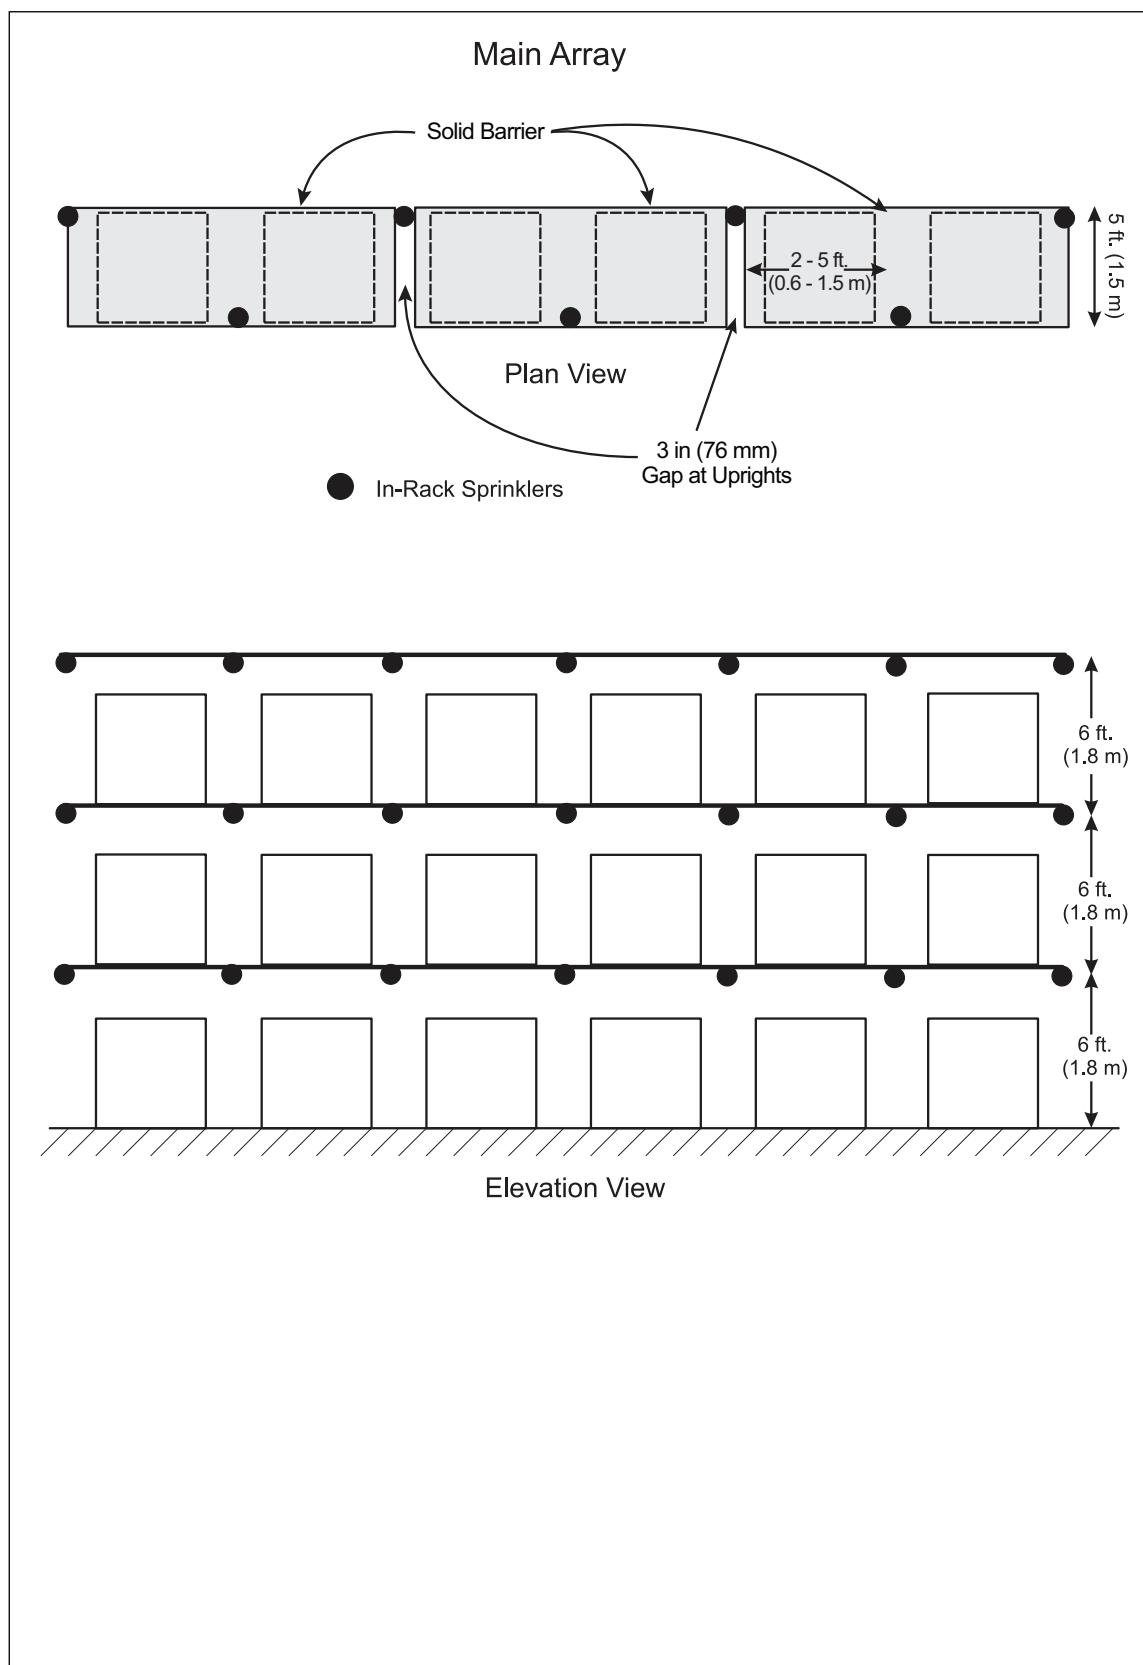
Single row rack sprinkler alternate layout: fire protection scheme F
